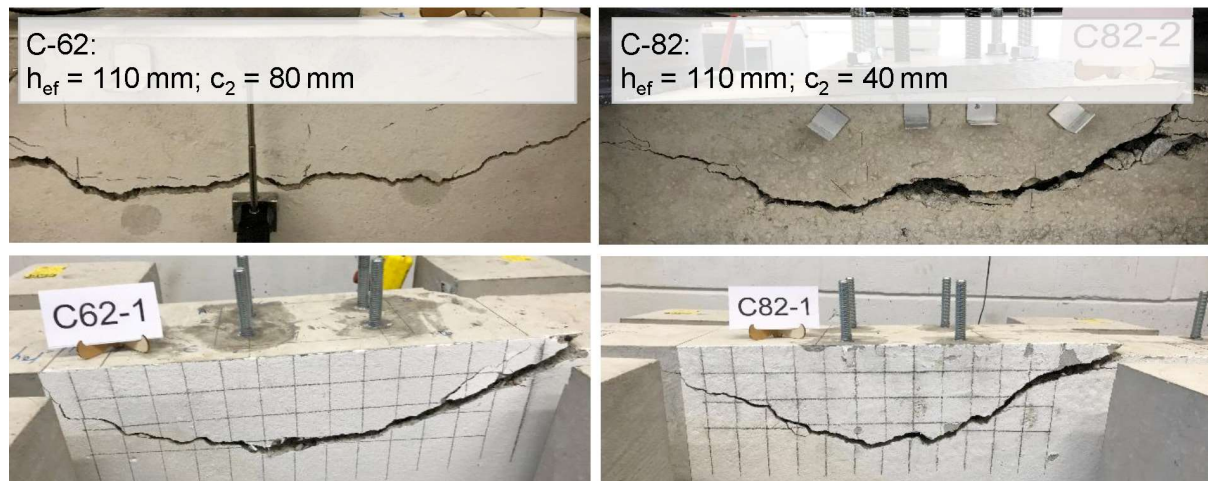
Typical crack patterns at the side surface of the concrete specimen upon failure in test series C-62, and C-82.
